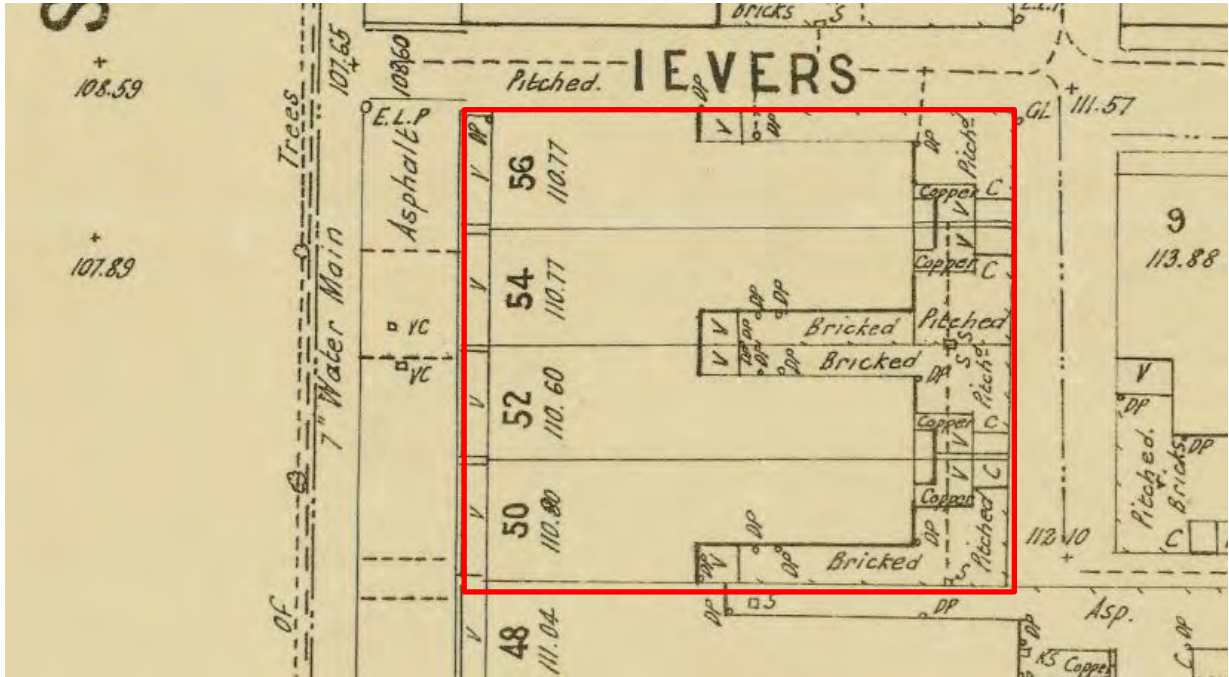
MMBW detail plan no. 1180 and 1181, 1896, with subject site indicated
